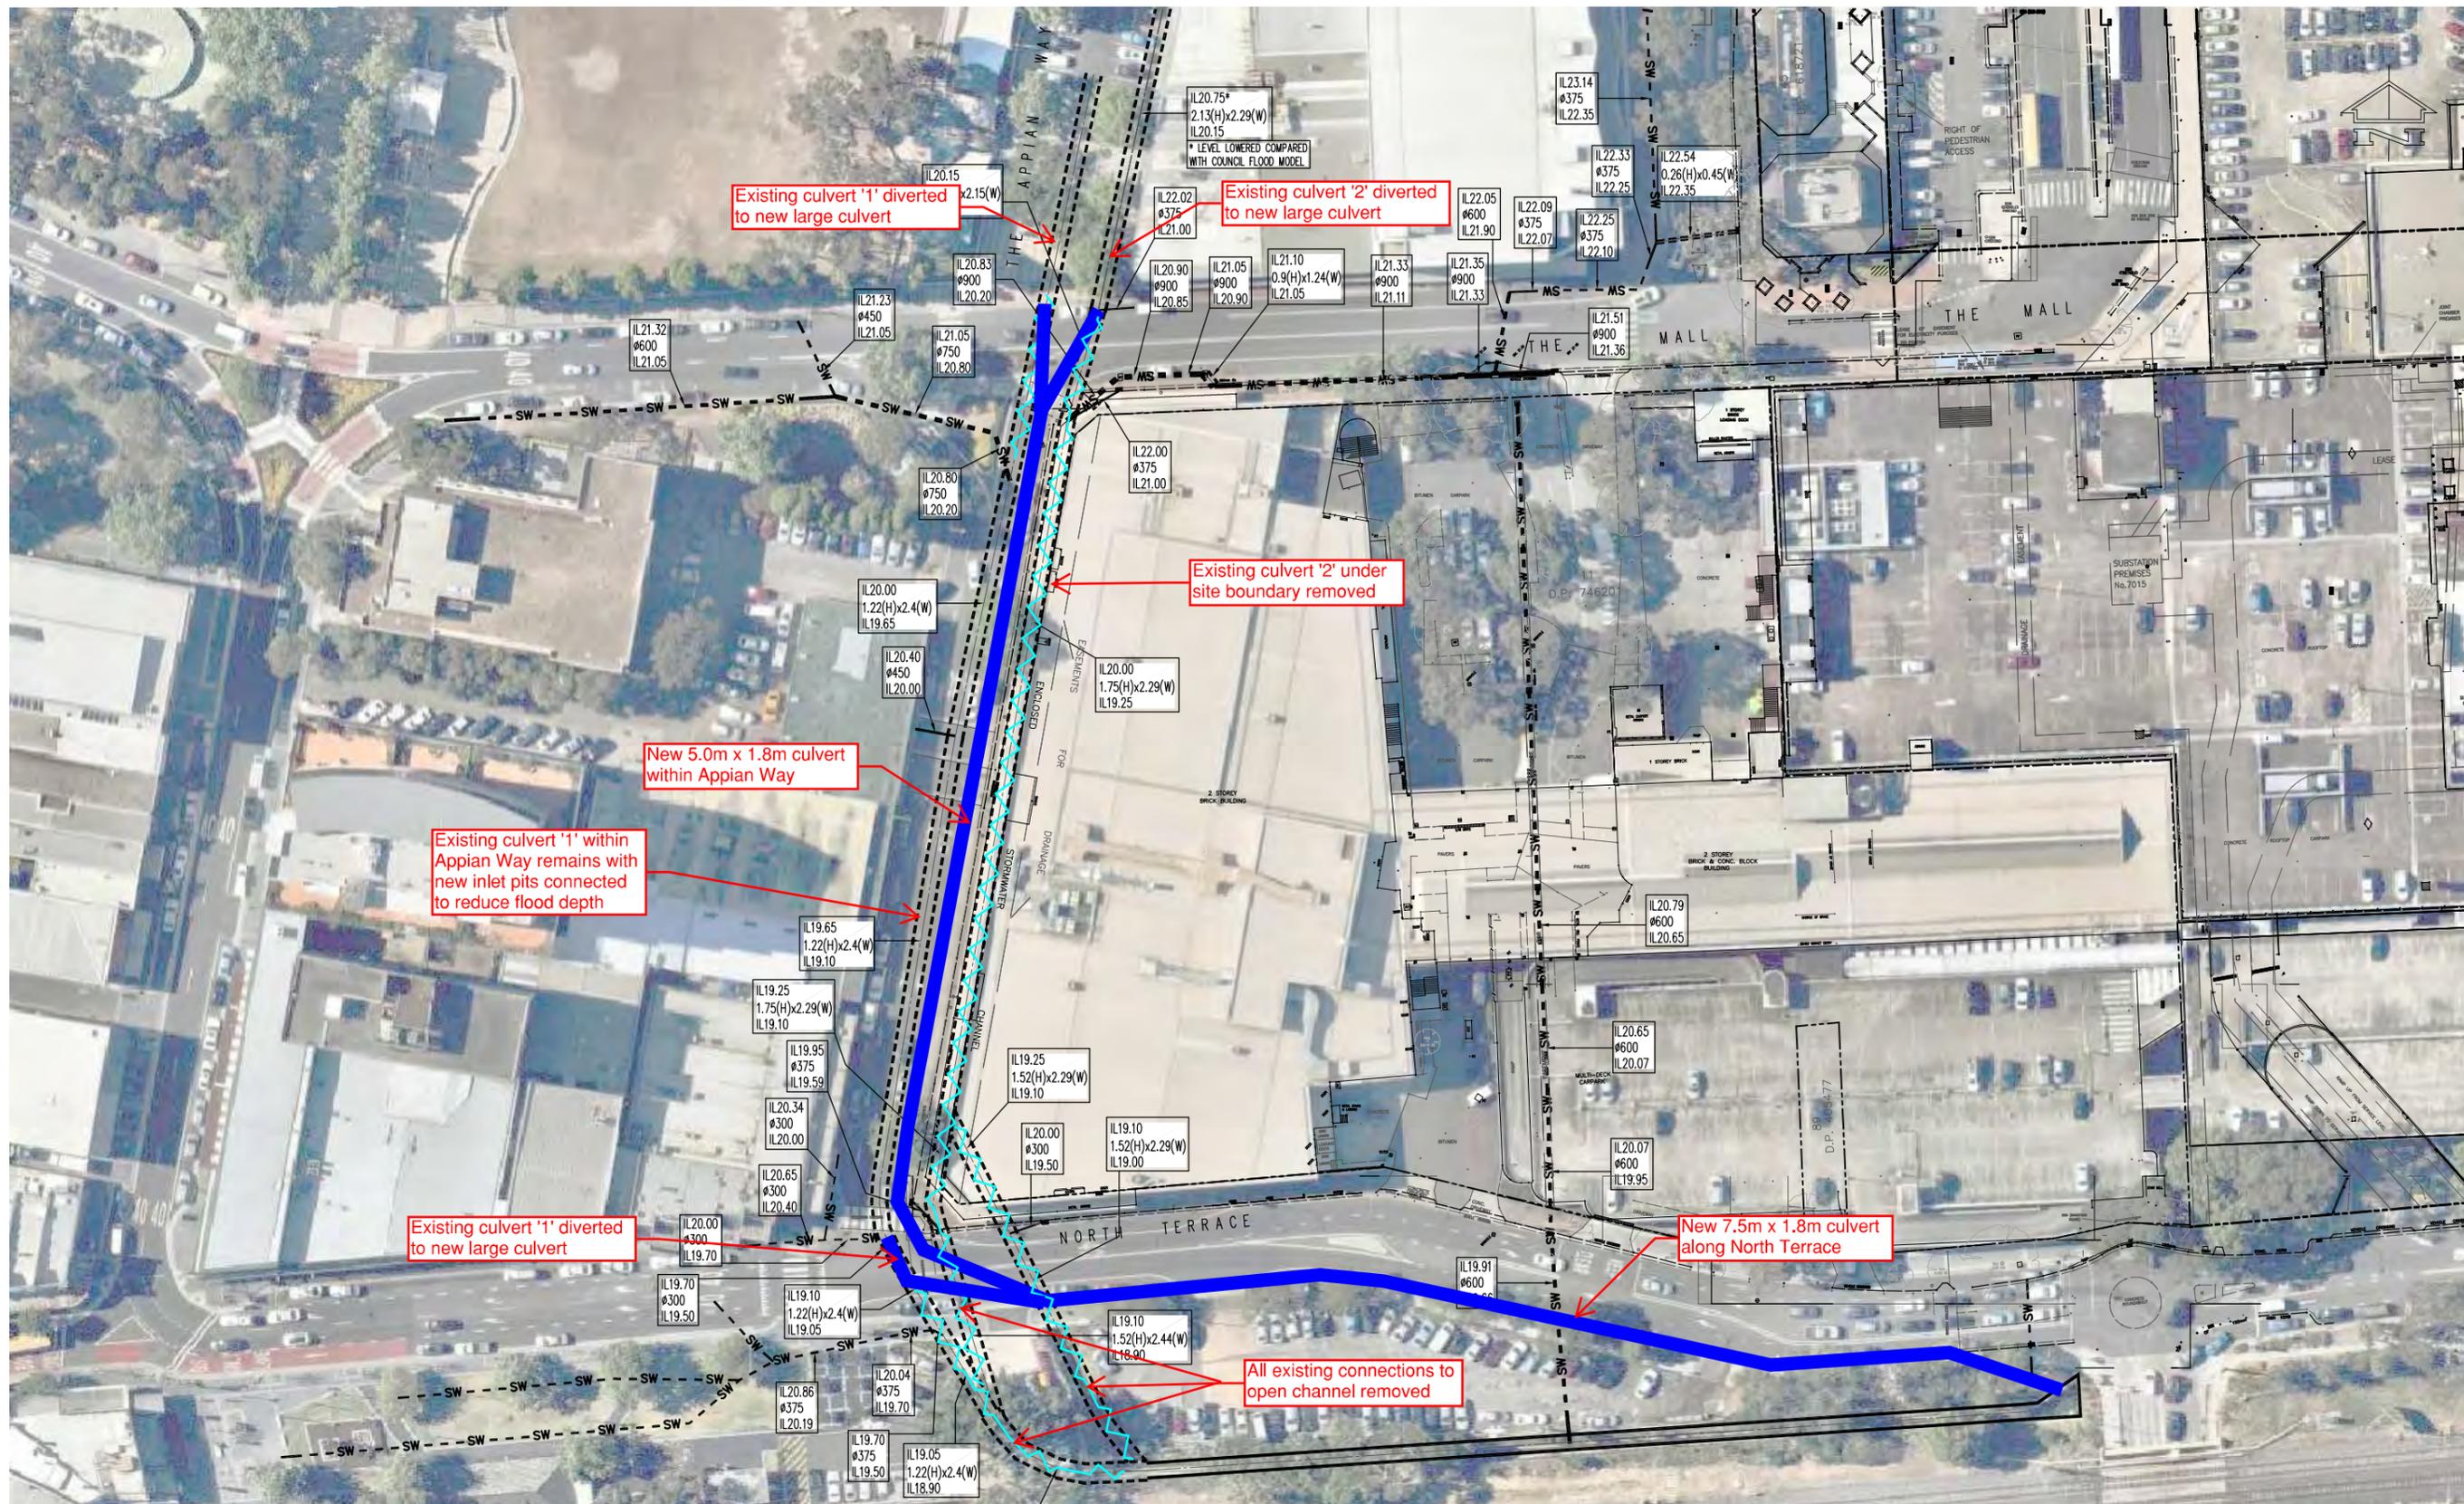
OPTION MP01: Large culvert in Appian Way, with culvert under site boundary removed
